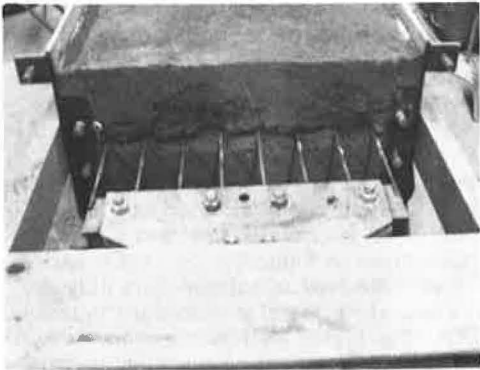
Failure in specimen with three steel-strip reinforcement for test 10.
